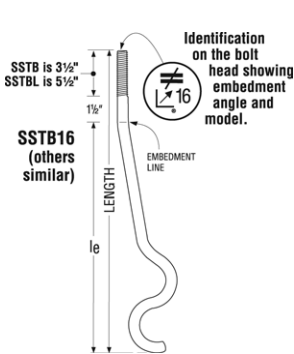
TYPICAL SSTB ANCHOR BOLT (Identification on Bolt Top, Req'd Embedment, l_e)
